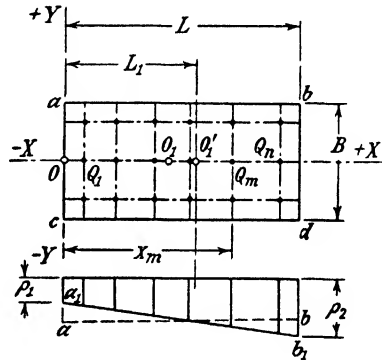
Upper diagram: loaded rigid concrete slab resting on piles; lower diagram: tilting of slab due to shifting of the center of the load from  $O_1$  to  $O_1'$ .
